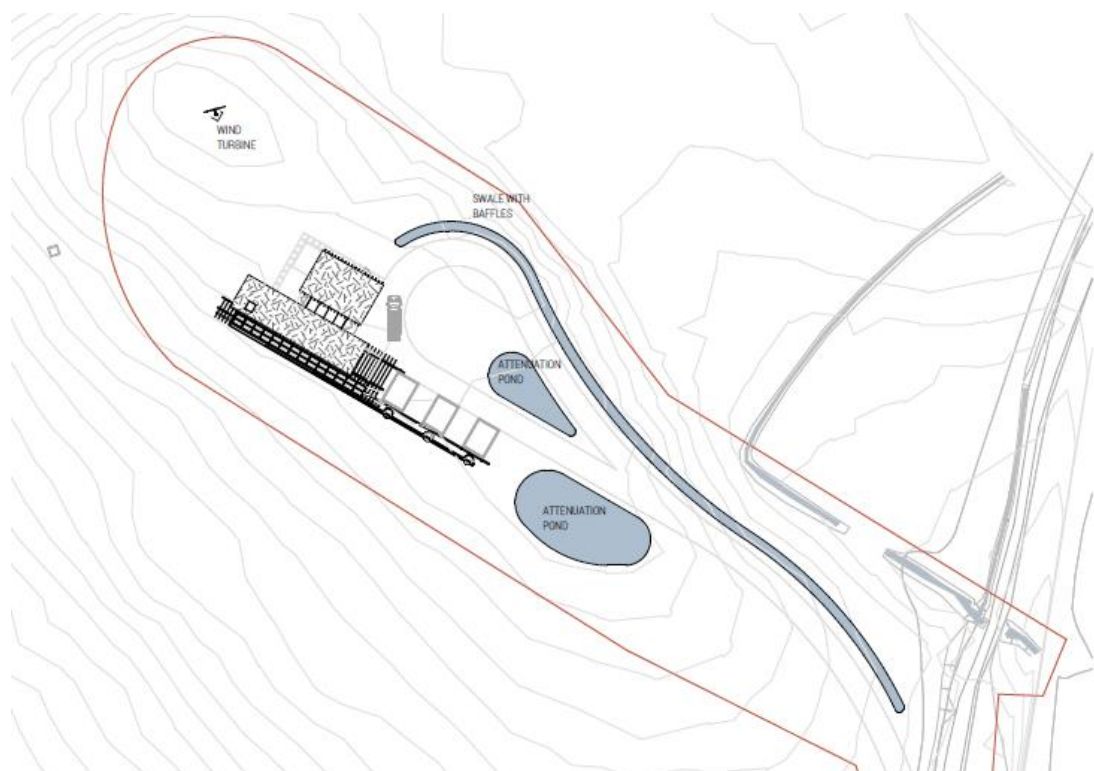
Proposed development with turbine, SWALE, building, driveway and attenuation ponds
